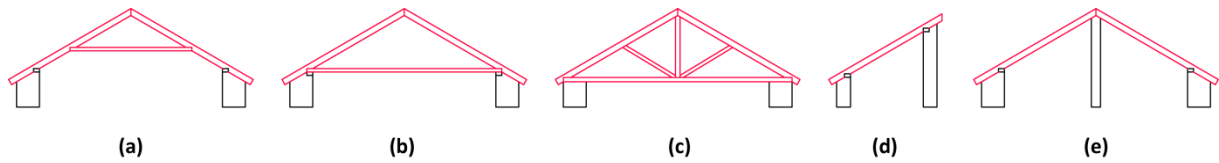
(a-c) Different non-thrust exerting roofing structural system; and (d-e) semi-thrusting roof types
